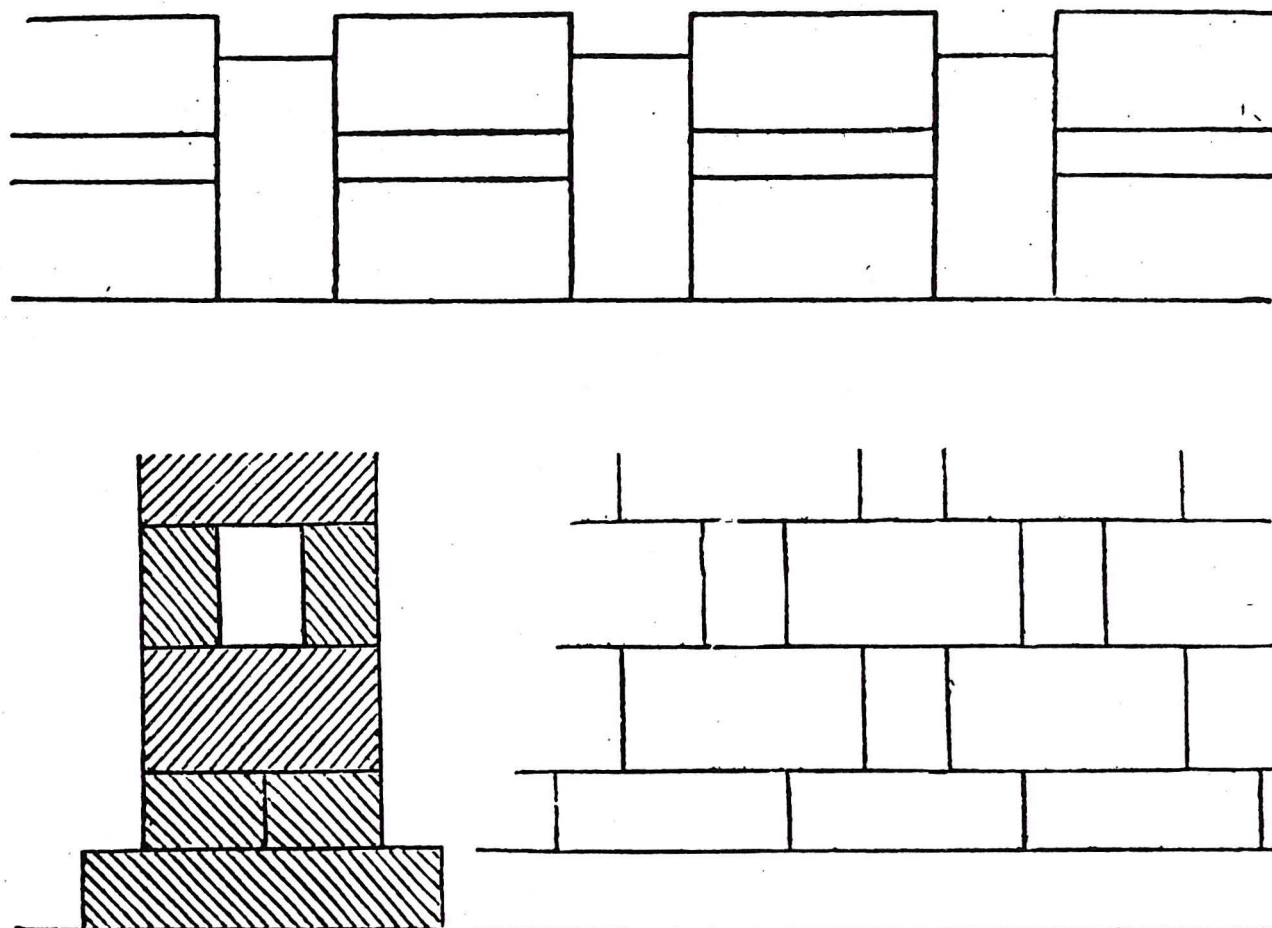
(Top) Loudon's hollow brick wall, eleven inches thick, plan. (Bottom) Silverlock's wall, nine inches thick, section and elevation. Allen, Cottage Building, pp 35, 34.
